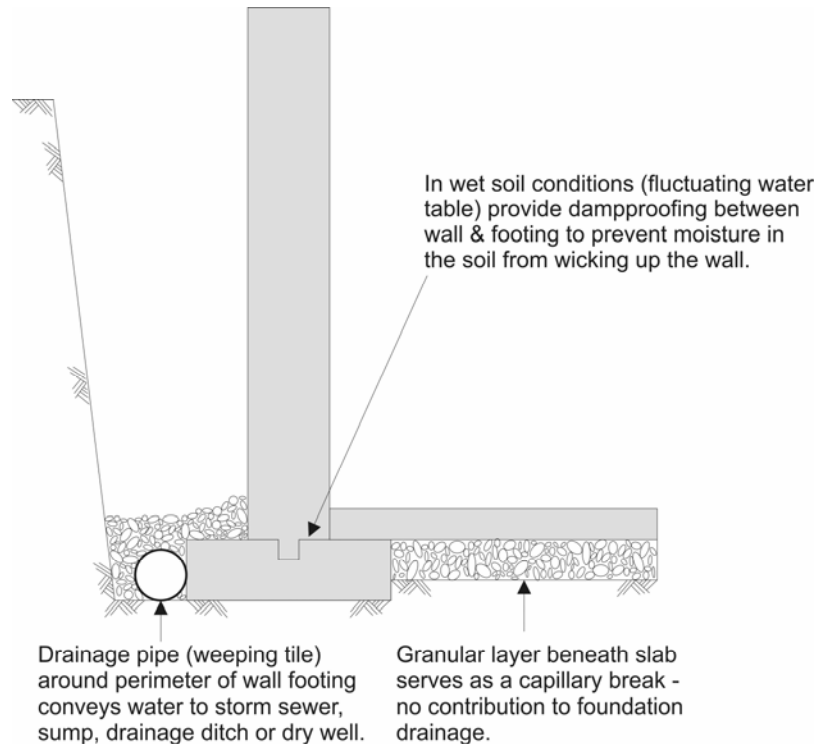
Schematic of perimeter drainage pipe and gravel approach to below-ground drainage.
